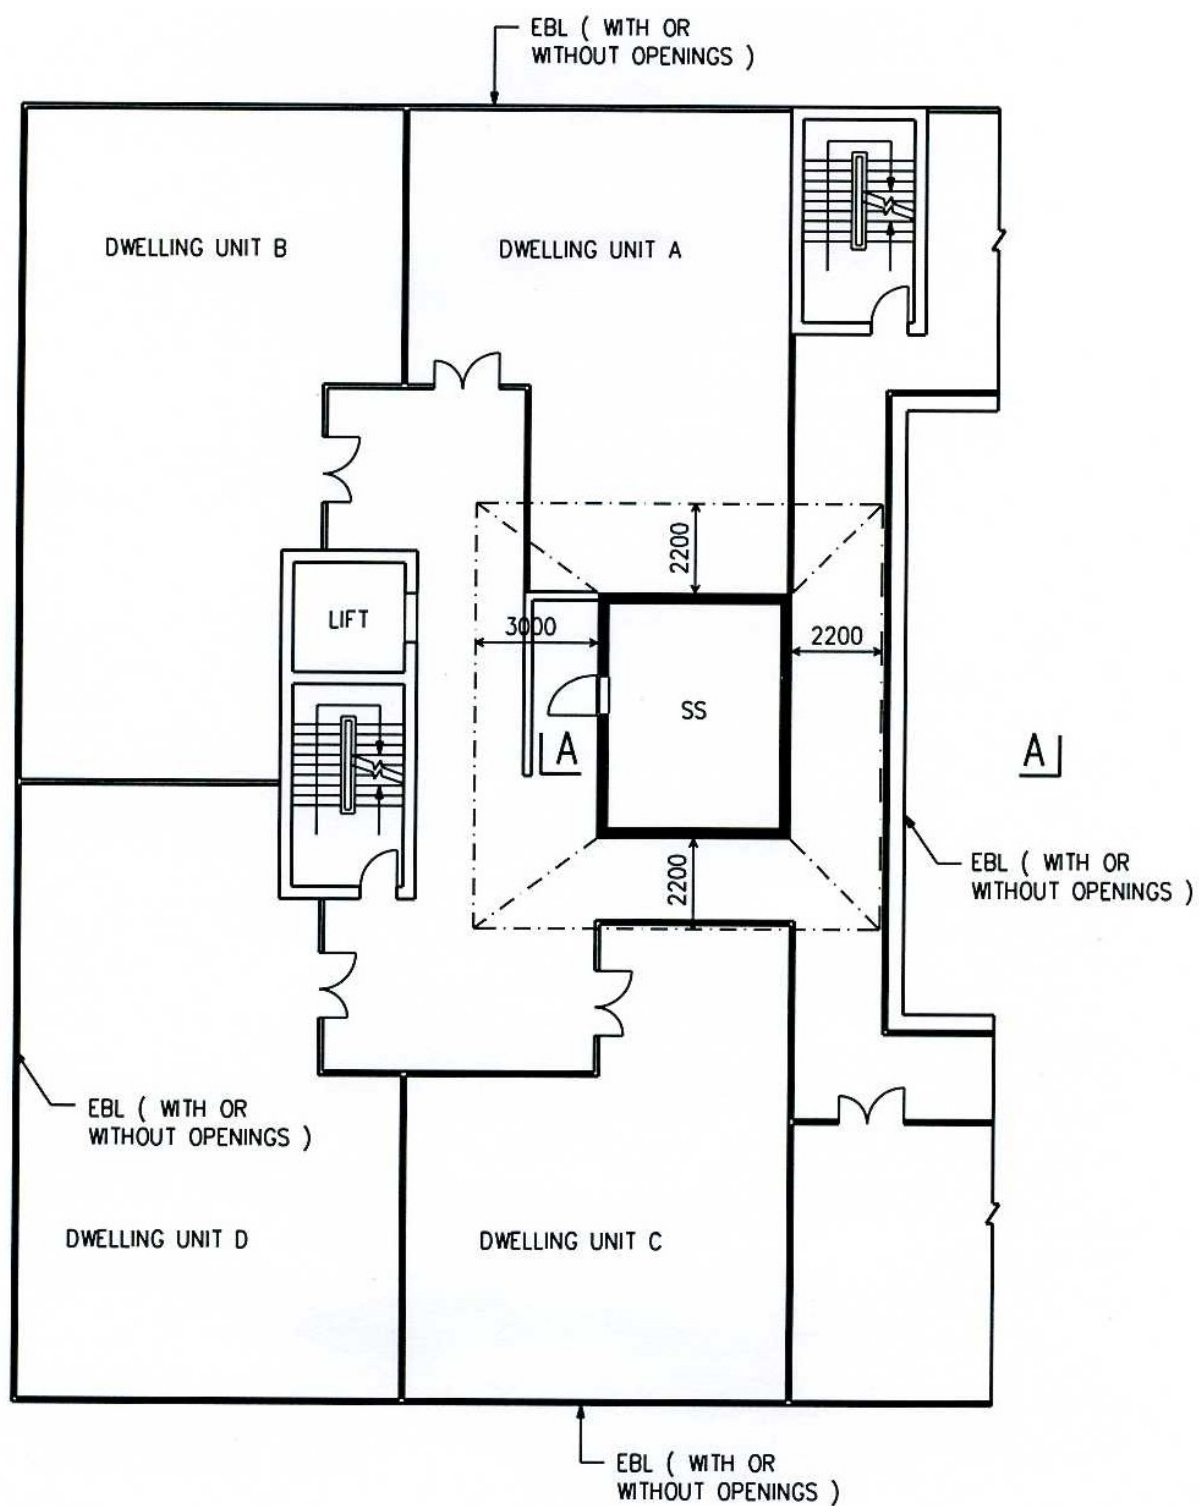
(a) REQUIREMENT ON SETBACK DISTANCE OF SS WALLS (WITHOUT DOWN-HANG BEAM) FOR STOREY HEIGHT \leq 2800 mm
